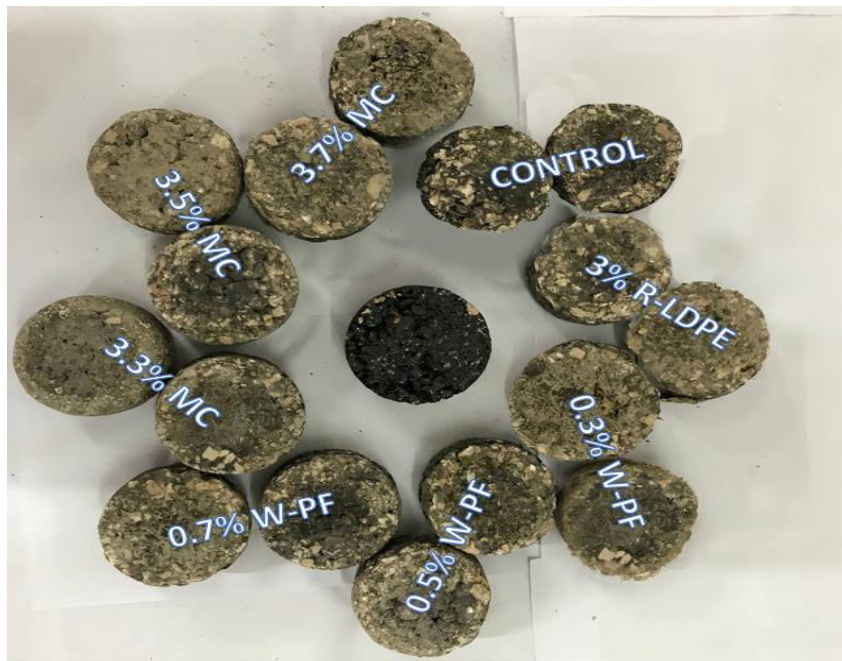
11 The Specimens After Cantabro Test Before and After Aging.
